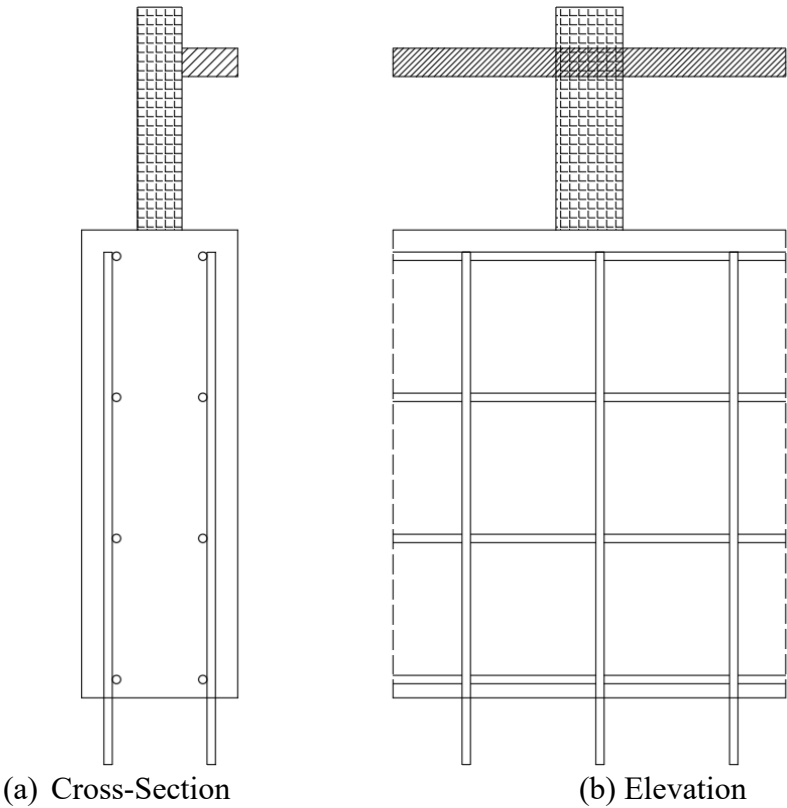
Concept 4 – Rigid Wall and Tall Elastomer Post Absorbing Rail System
